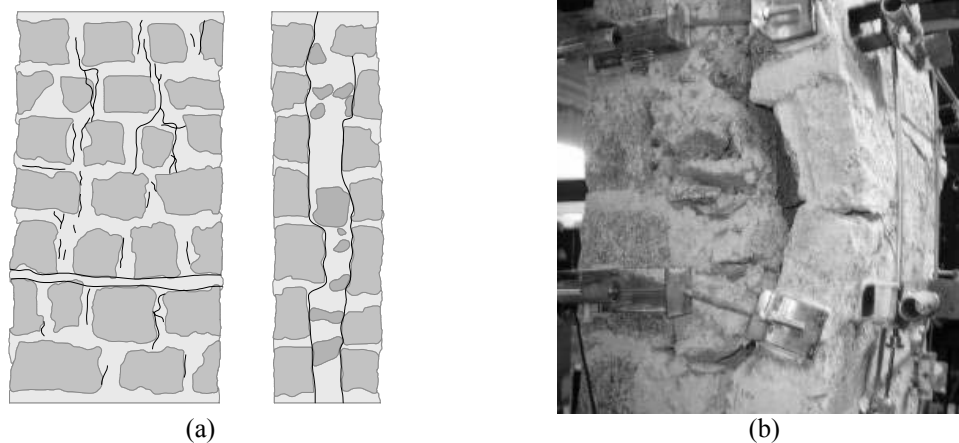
Failure of wall 2W1 (unstrengthened): (a) crack pattern close to failure; (b) rotation of the external leaf.
